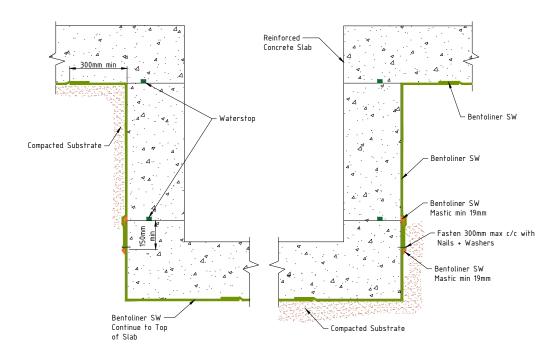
BentoLiner® SW under elevator pit slab and on excavation cut walls
